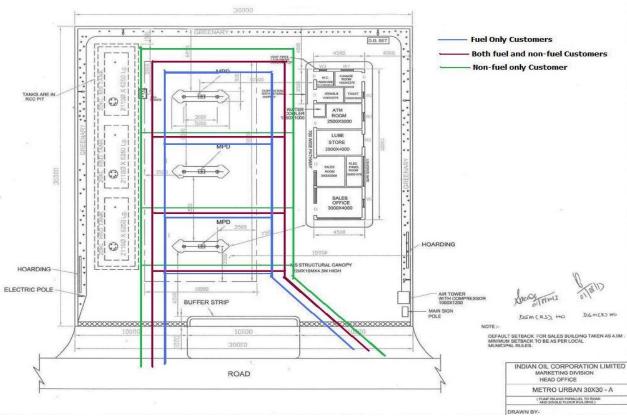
Footfall pattern for three types of customer in retail outlet layout type -2.
